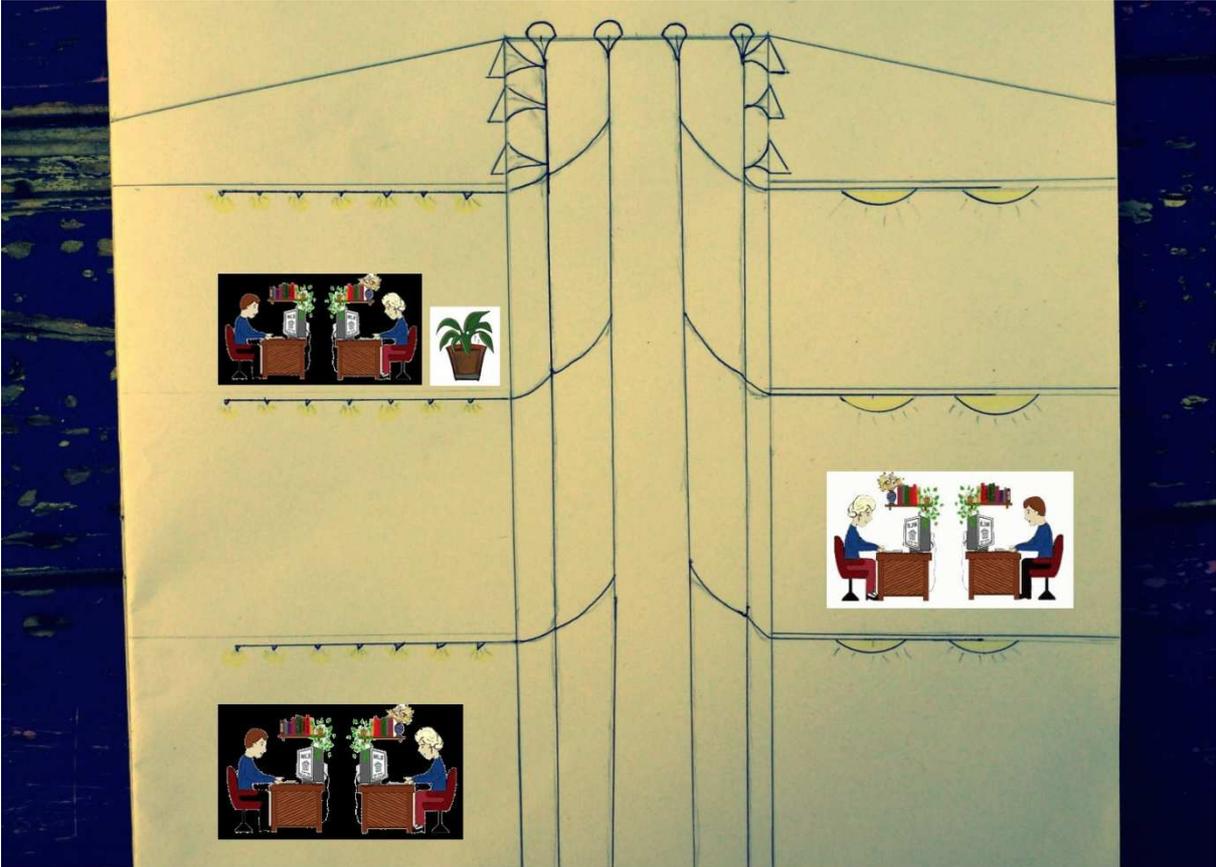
Daylight system integrated into the core of an earthquake-proof building. Dome-shaped light collectors are installed on top of the concrete core, whereas tilted panels line the lateral surface. Glass fibres, potentially in fascicles, guide light to the inside of the building. Light can be diffused by *luminaires* that integrate natural and artificial light sources (right side) or at spines on the lower surface of the light-guide. Spines have been reported to out-couple light from spicules (Aizenberg et al., 2004) and could be introduced by localized syneresis (Wang et al., 2012b). © for inset cartoons by serradinho.com
